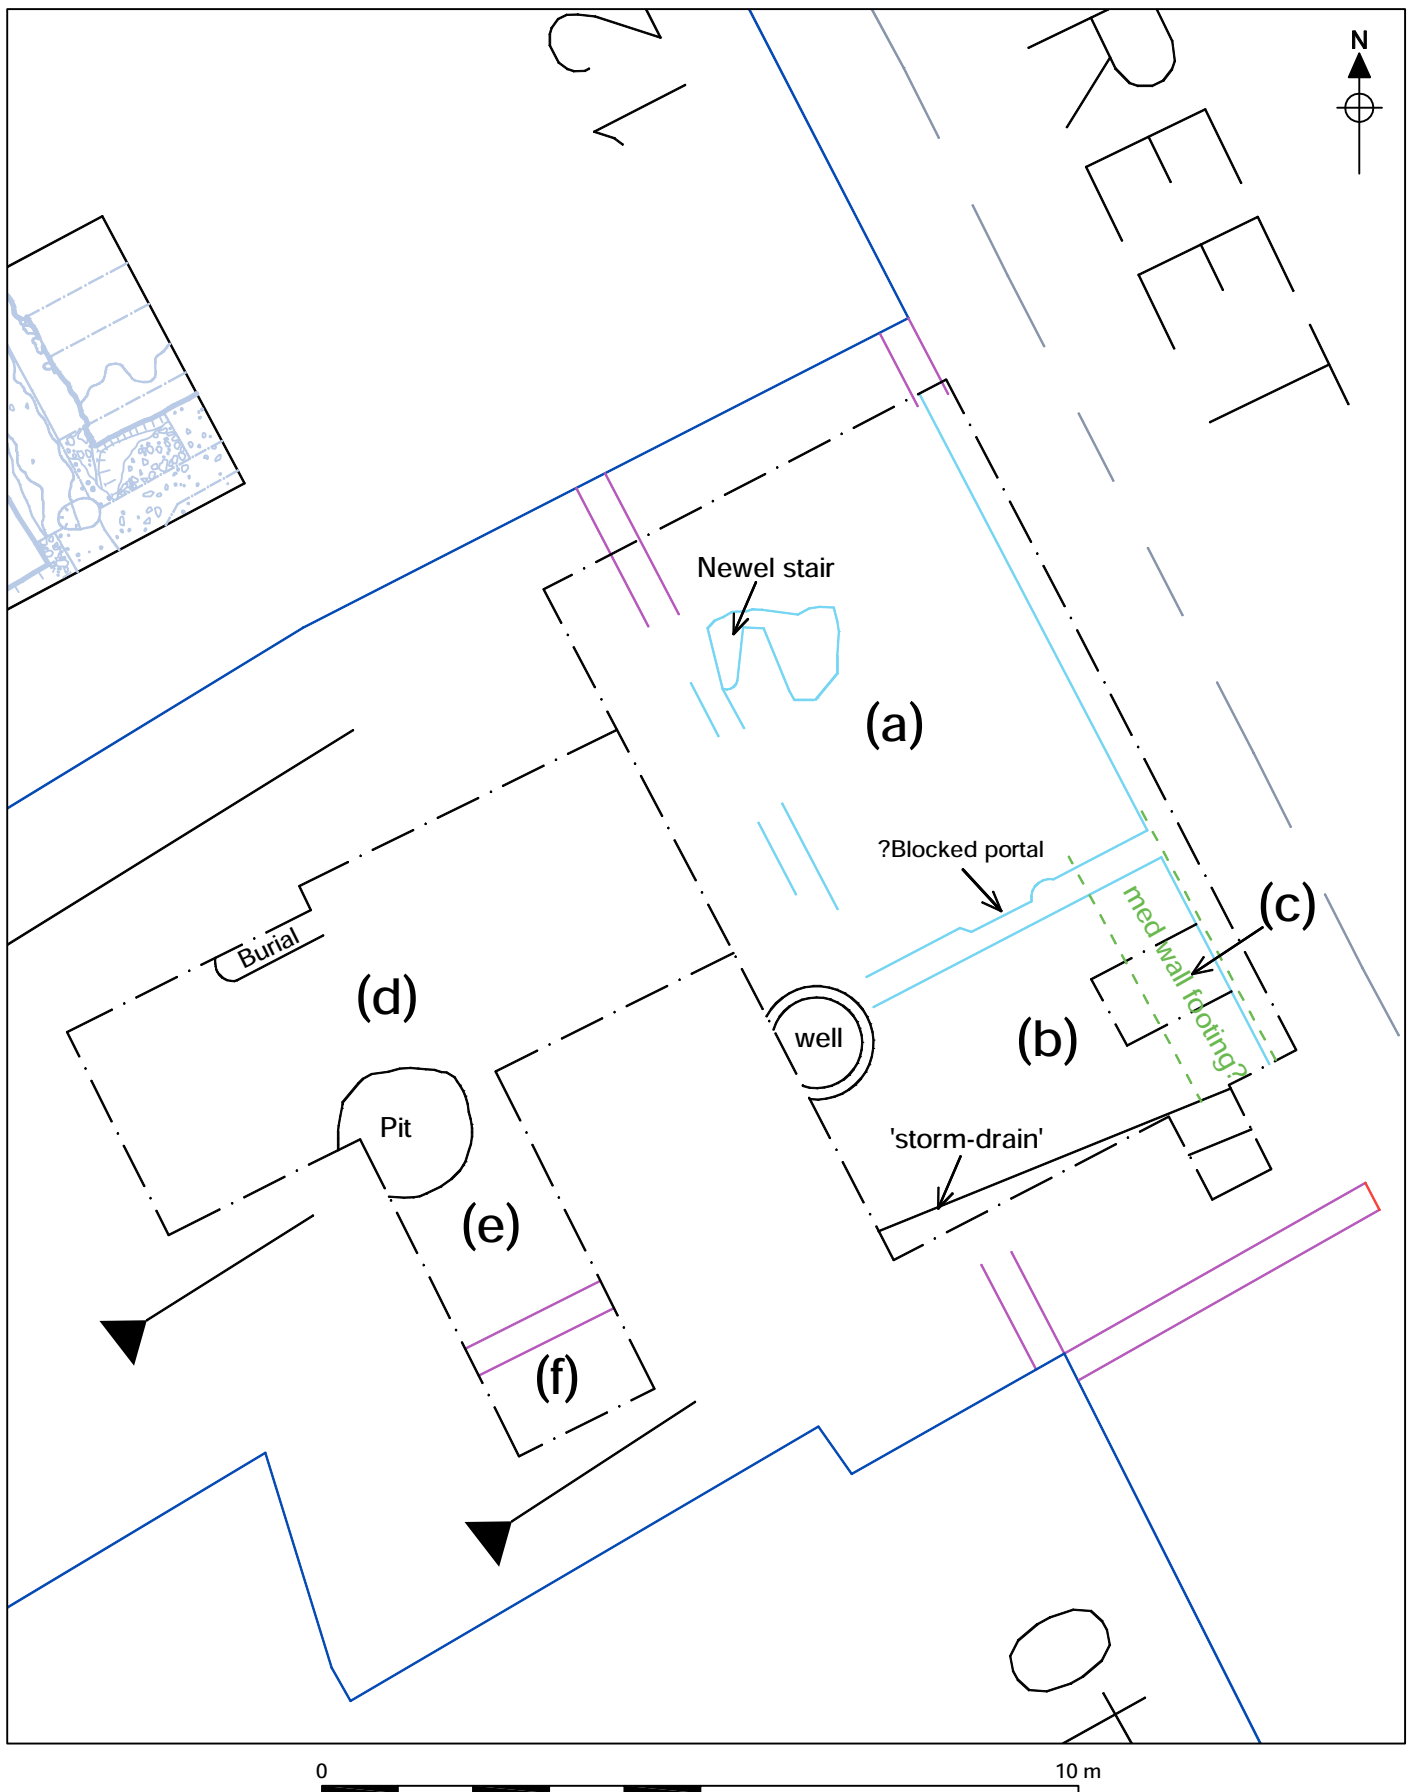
Atkin's Excavation - schematic plan. Scale 1:100
